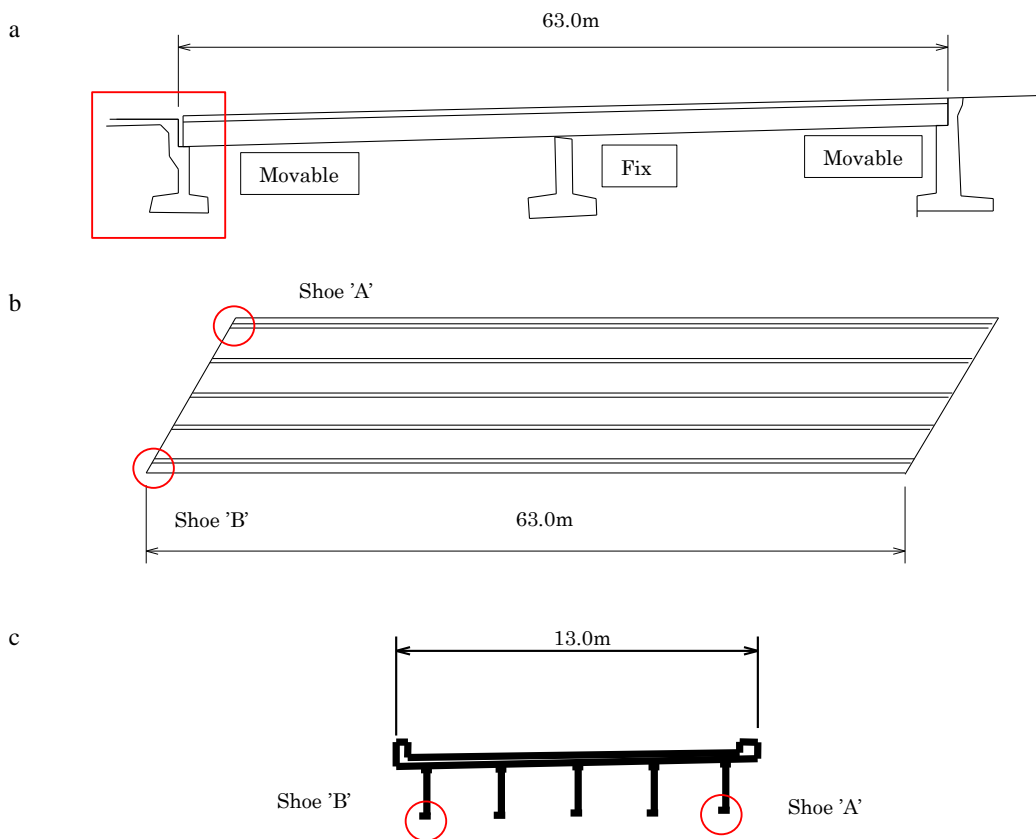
Structural drawing of the bridge (a) side view; (b) plan view; (c) cross view.
